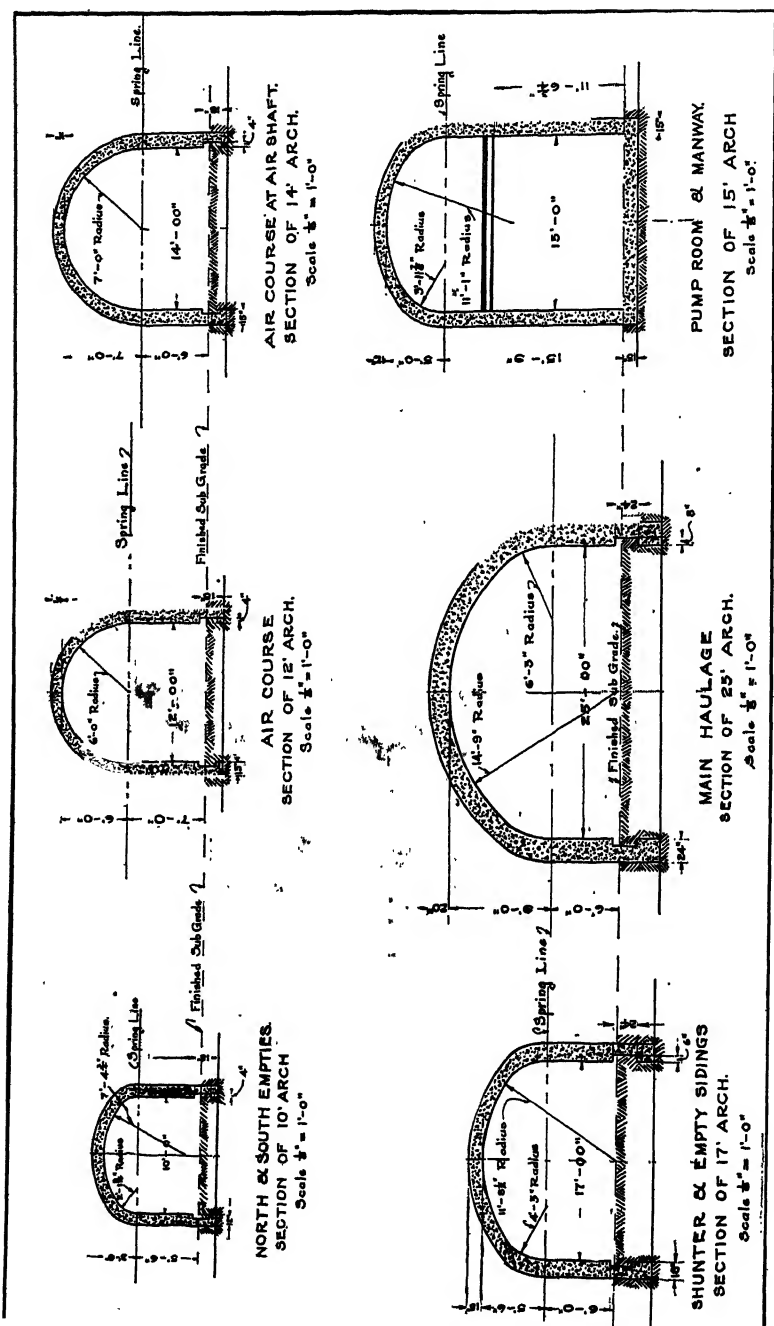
CROSS-SECTIONS OF CONCRETE ARCHES AT MINE BOTTOM.
